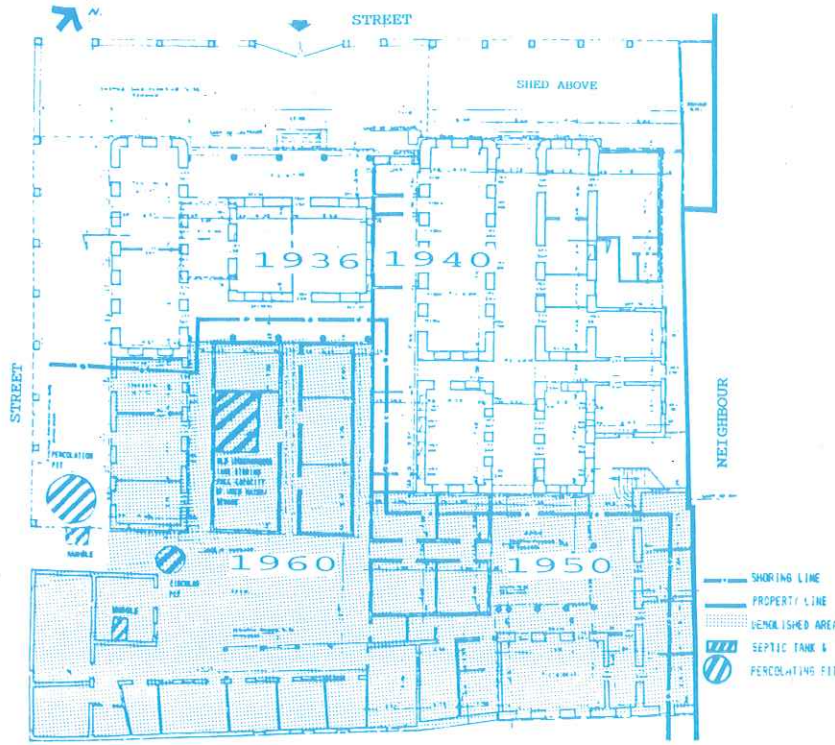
PLAN OF KUWAIT'S FIRST COURTHOUSE
